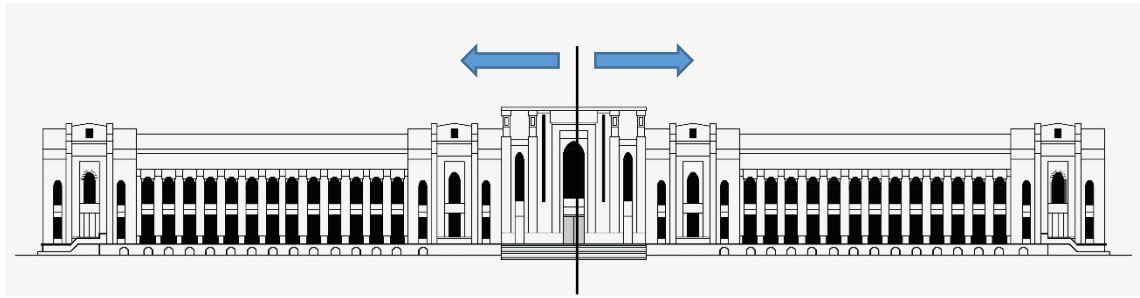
Openings on the Main Façade, Post Office, Tehran. Drawing by the Author (2020).
